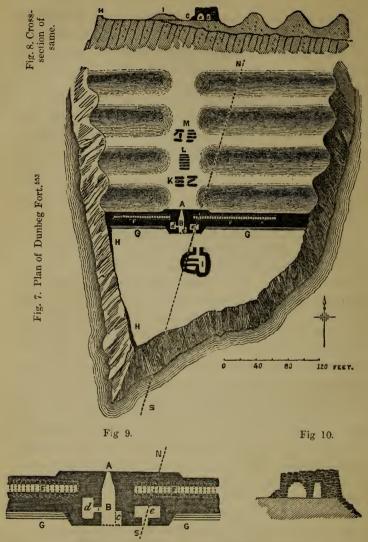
Plan and (fig. 10) cross-section of wall of Dunbeg Fort.
